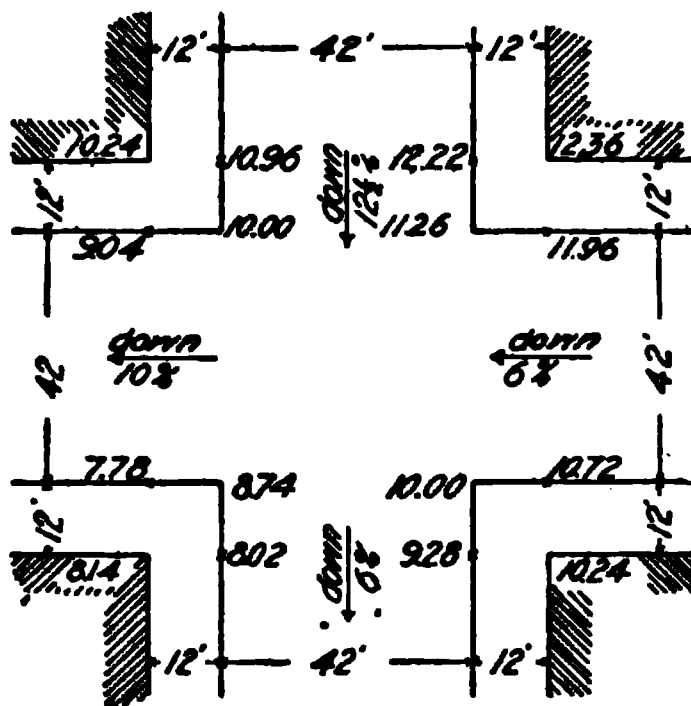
GRADES AT INCLINED STREET INTERSECTION.
